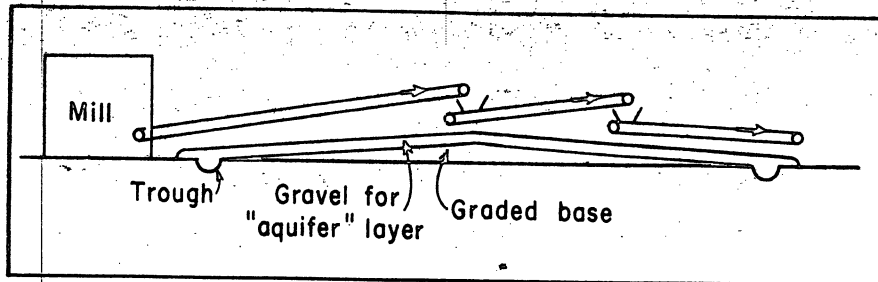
Where foundation conditions are suitable, a permanent drainage system would collect water and allow it to flow through a gravel layer to a peripheral trough. Conveyors transport refuse from the mill to all areas of the disposal site.
